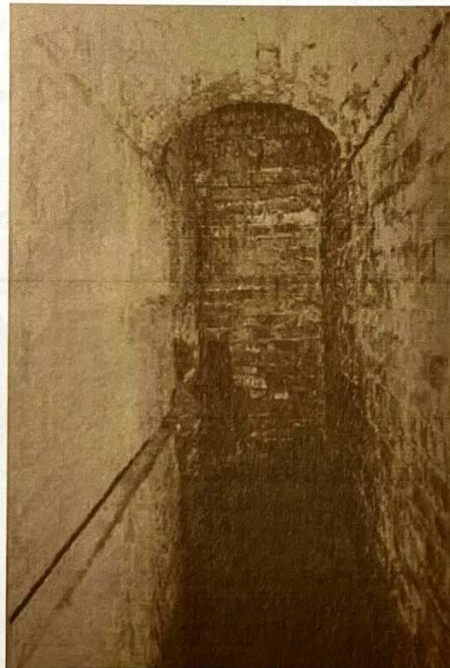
Anchorage tunnel 6m long x 2.2m x 0.7m.
